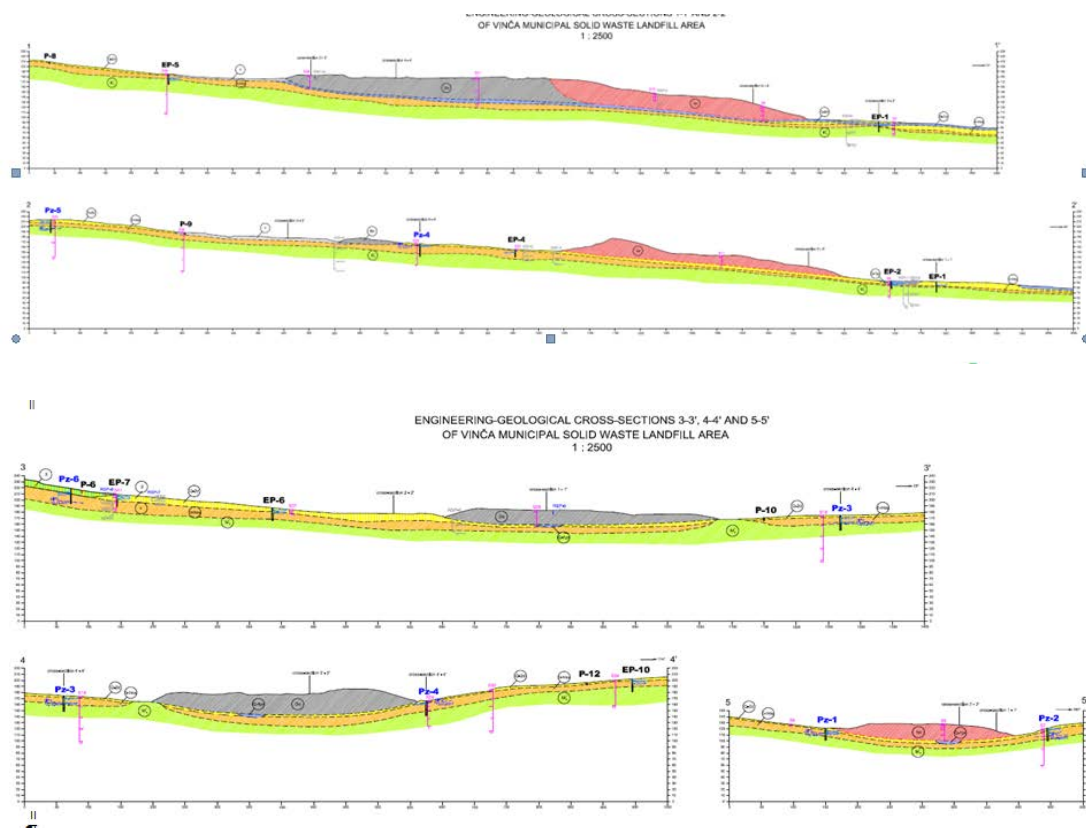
Piezometer position, cross-section, Geological-geotechnical testing for the design and construction of a New landfill in the municipal waste landfill complex at Vinča Energoprojekt Niskogradnja, 2017.
